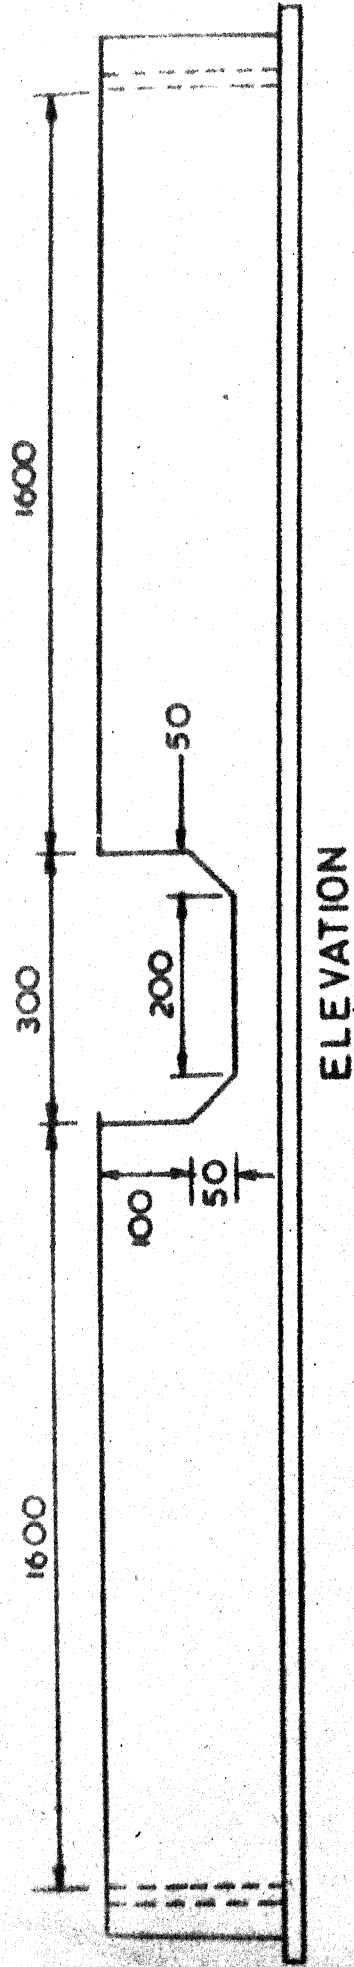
DETAILS OF MOULD FOR BEAM SPECIMEN
